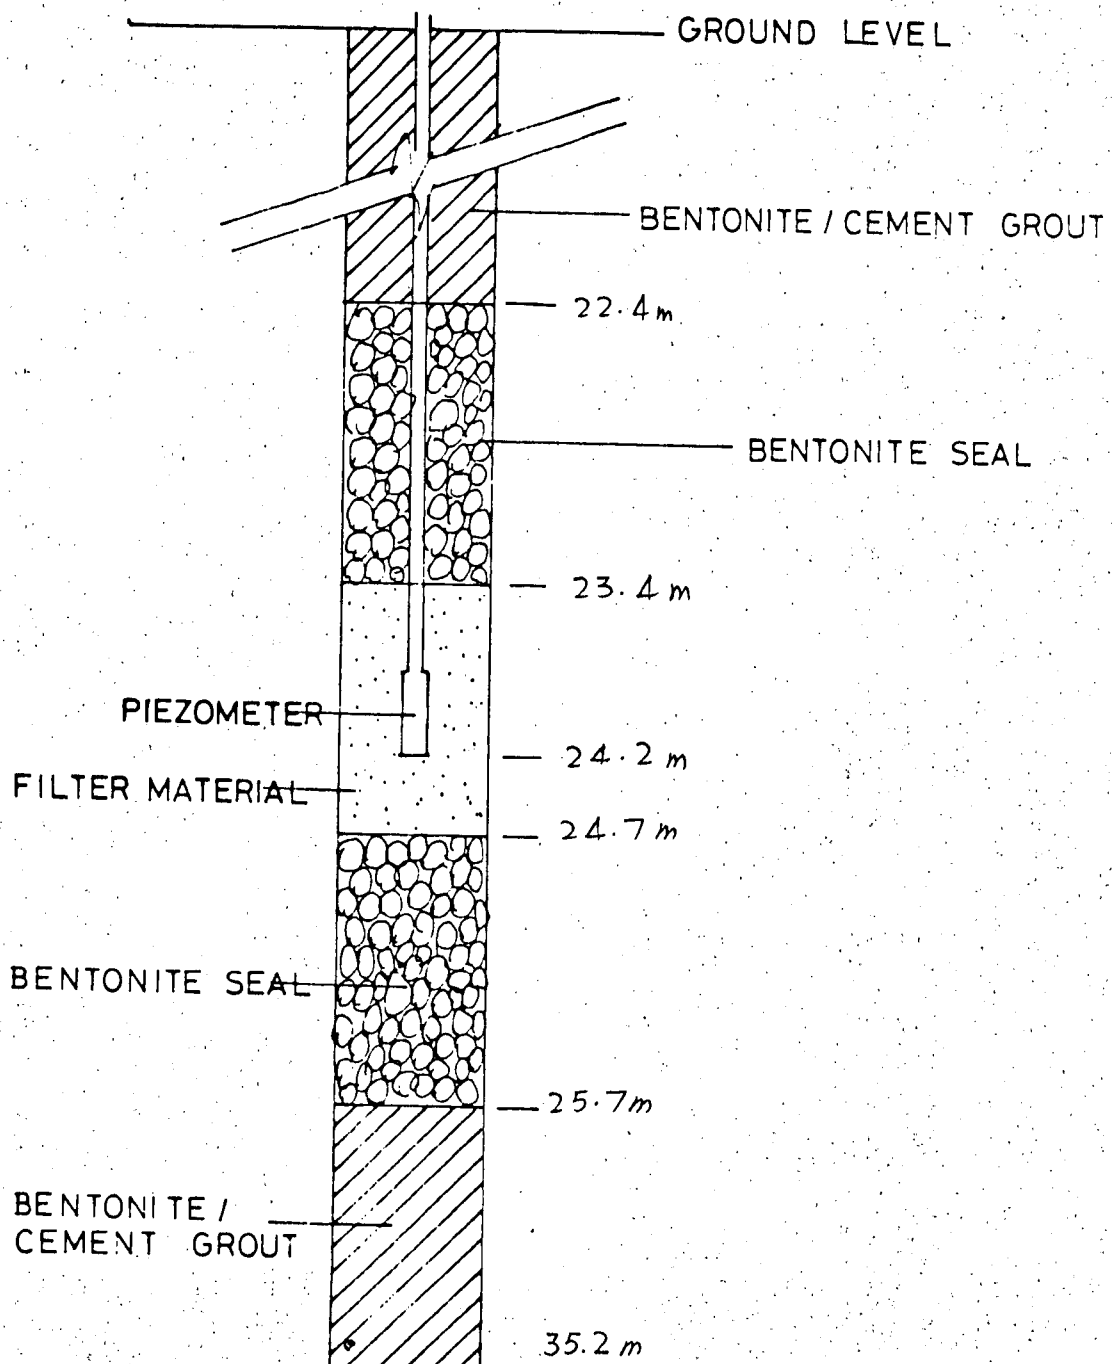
# DETAIL OF STANDPIPE PIEZOMETER INSTALLATION
